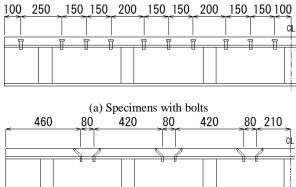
Geometry of specimen for flexural test (unit: mm)
